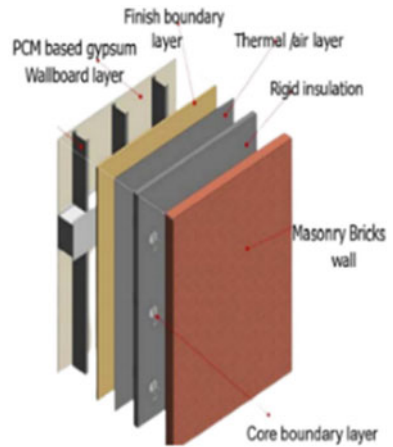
MPCM-based gypsum wallboard added to the wall [63]
